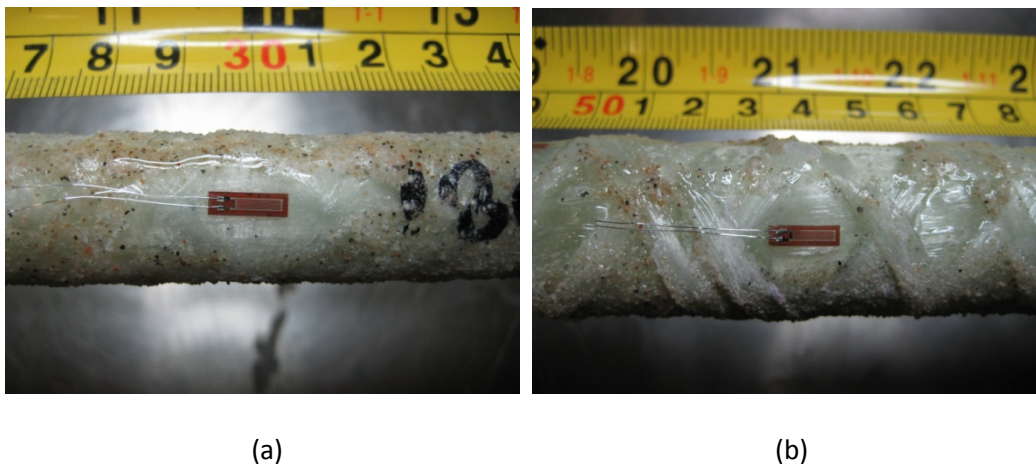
Strain gauge applied on (a) specimen 6-3 and (b) specimen 8-3.
